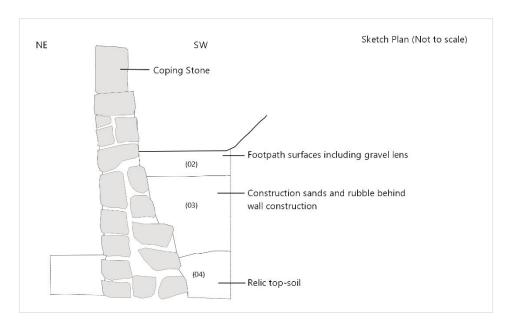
Sketch plan showing the profile of the south-eastern section of perimeter wall
